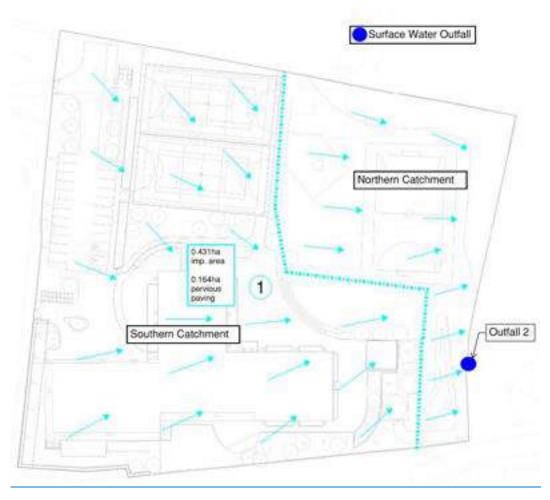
Llanilltud Faerdref Primary School proposed drainage catchment plan
